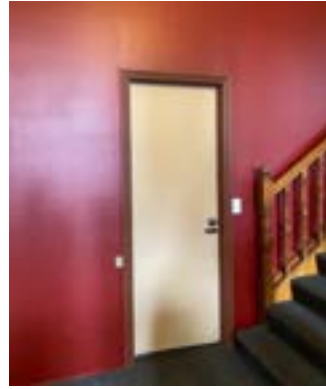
Eastern wall and non-original openings in Existing Office R.G-02. To the right of the image is a later stair that connects to the 1980s section. Source: Trethowan Architecture, 2023.
